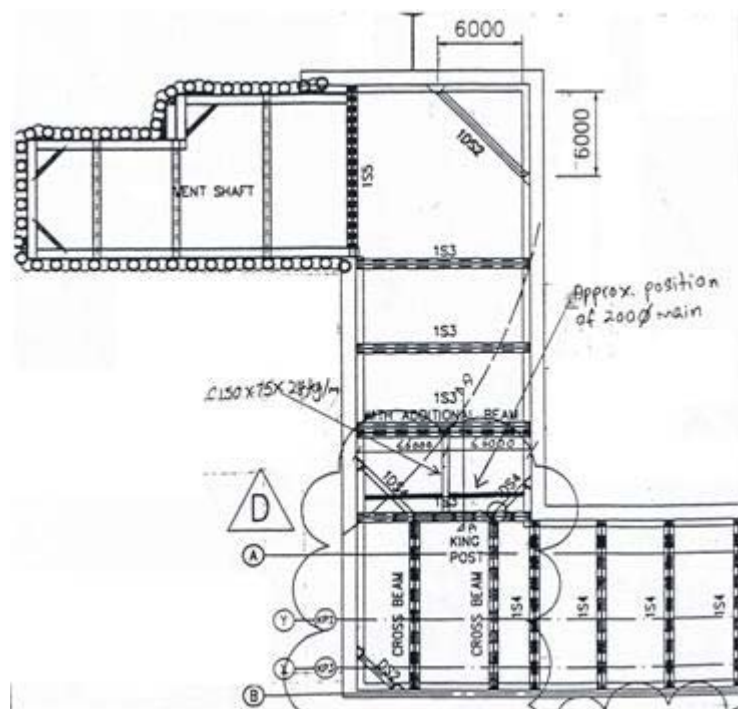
Corner struts, struts/KP supporting water main and manhole.
